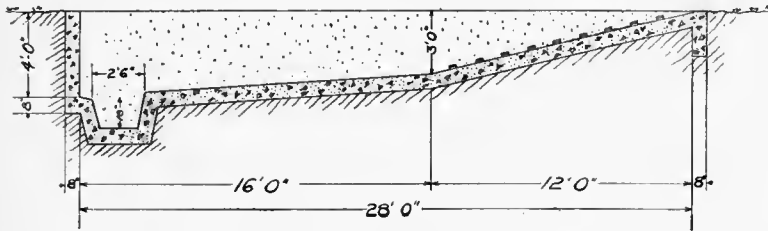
Sectional Drawing of Shallow Concrete Manure Pit.
